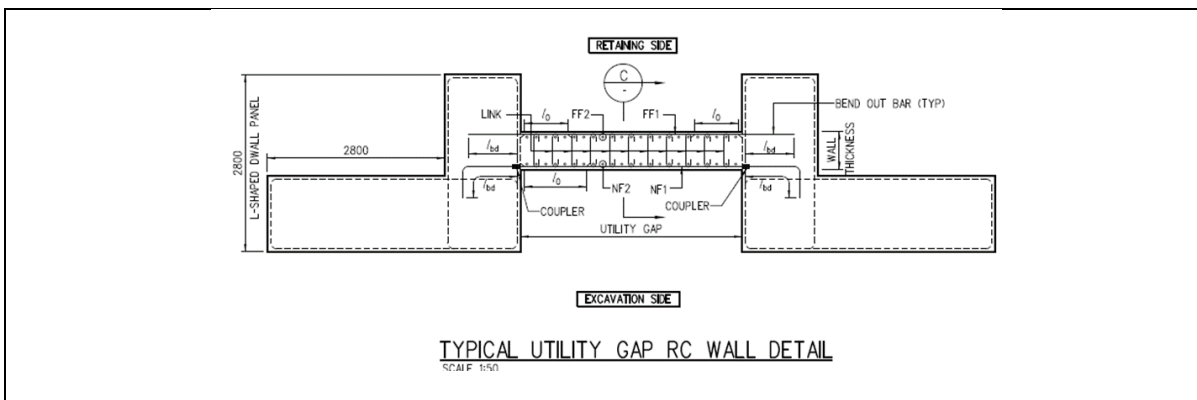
Example of Reinforced Concrete (RC) Lagging
